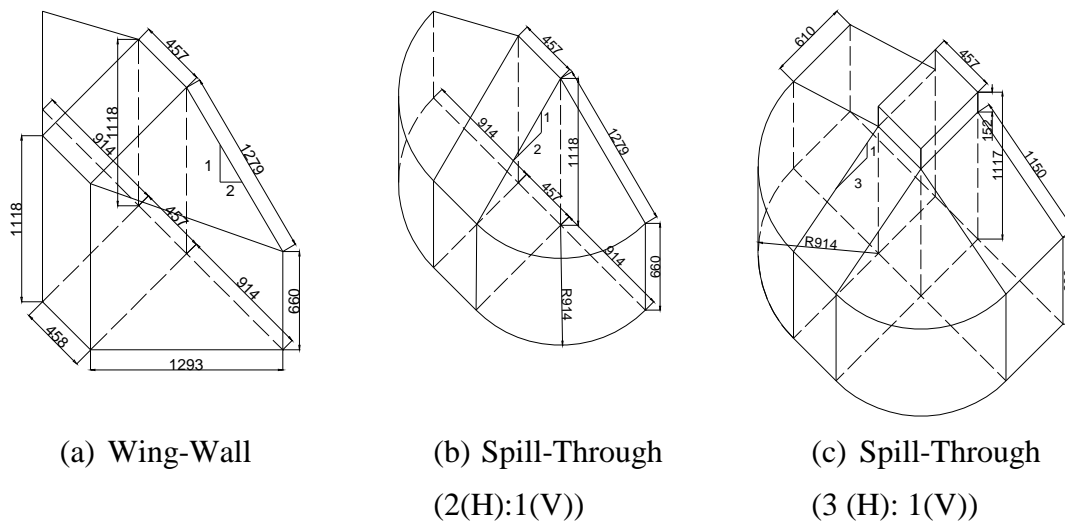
Abutment shapes (all dimensions are in mm).
